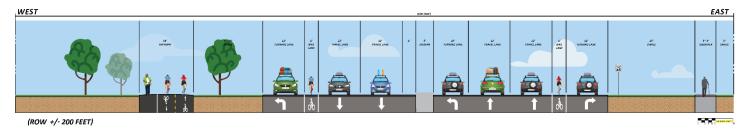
Proposed Typical Section, SR-5/Federal Hwy
